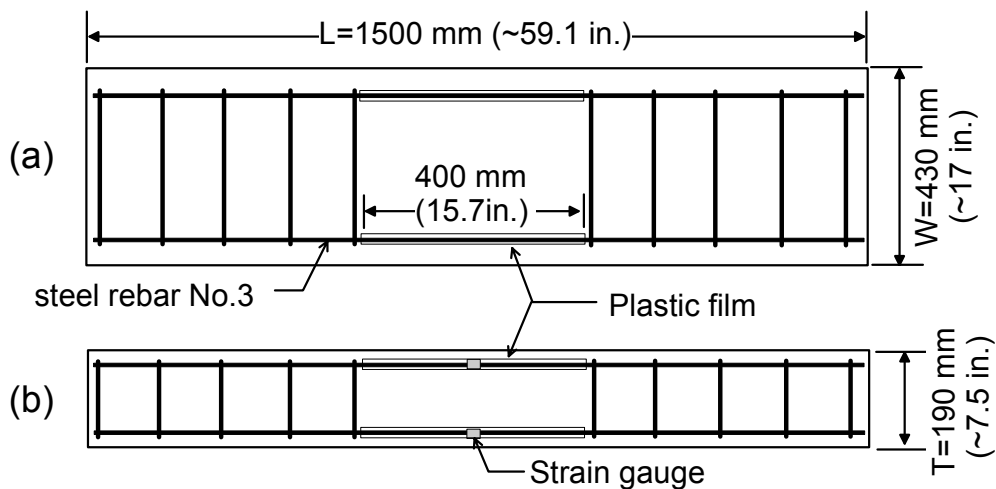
Details of a concrete specimen: (a) top view, and (b) side view.
